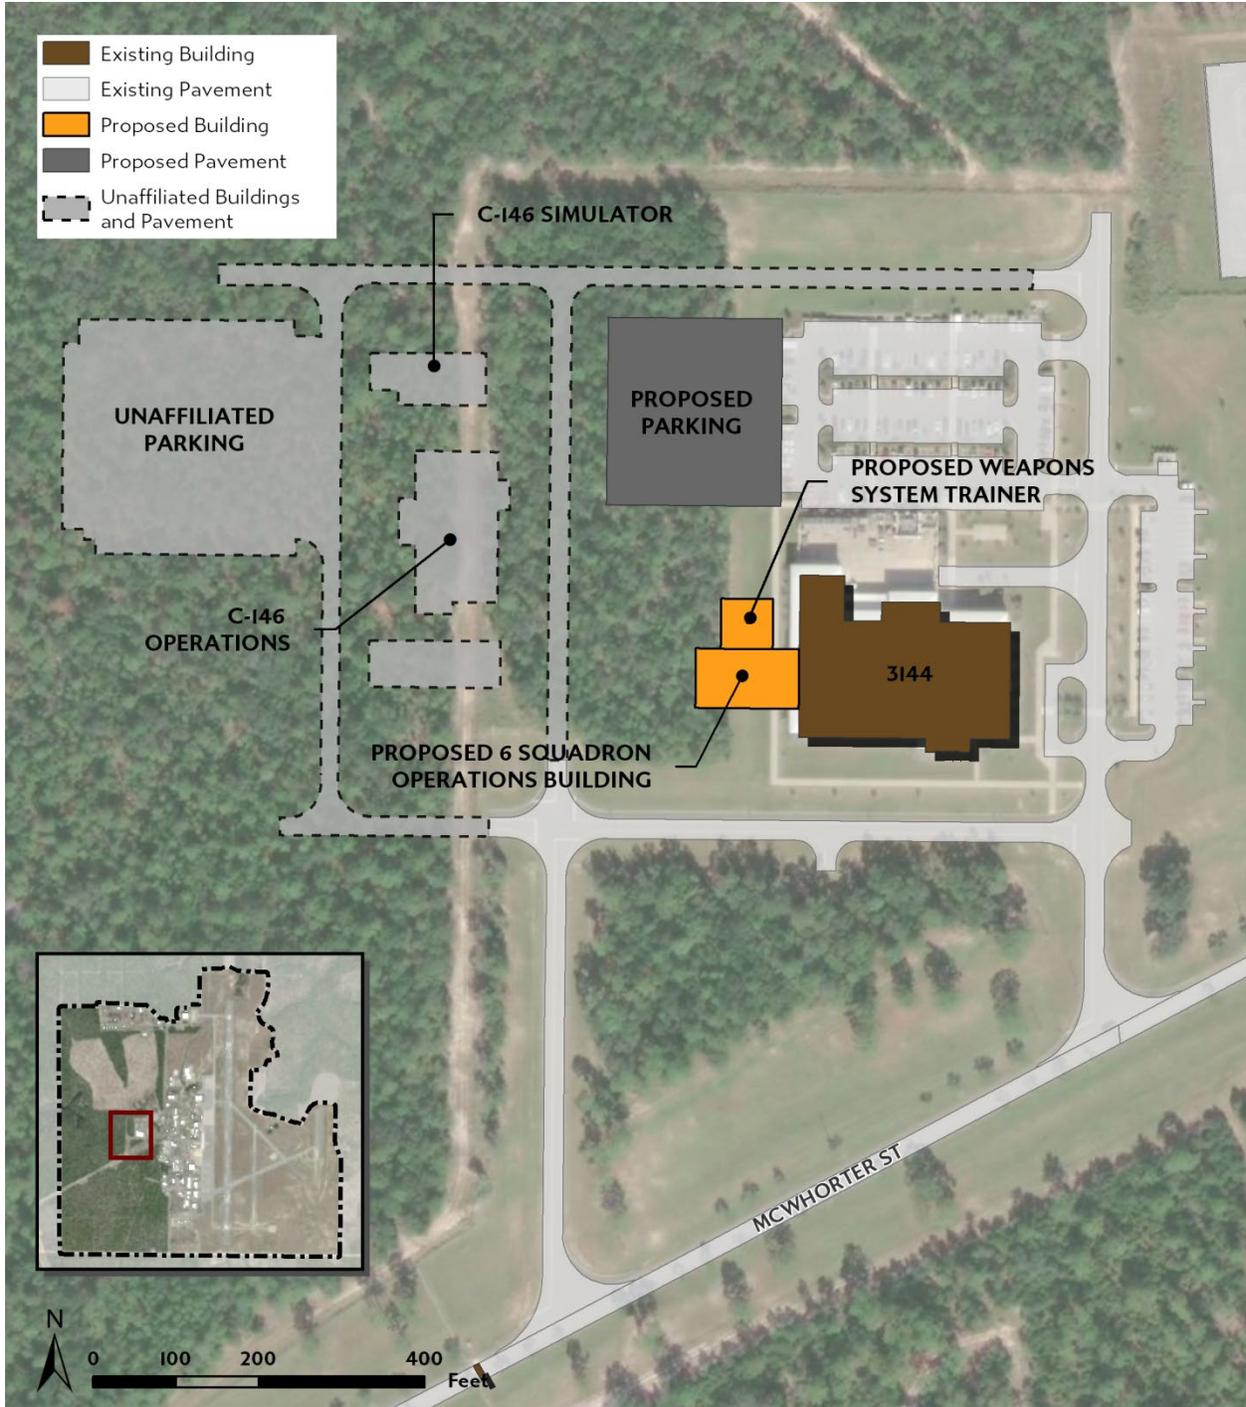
Duke Field Site EA Site 1 Planned Future Construction Projects
